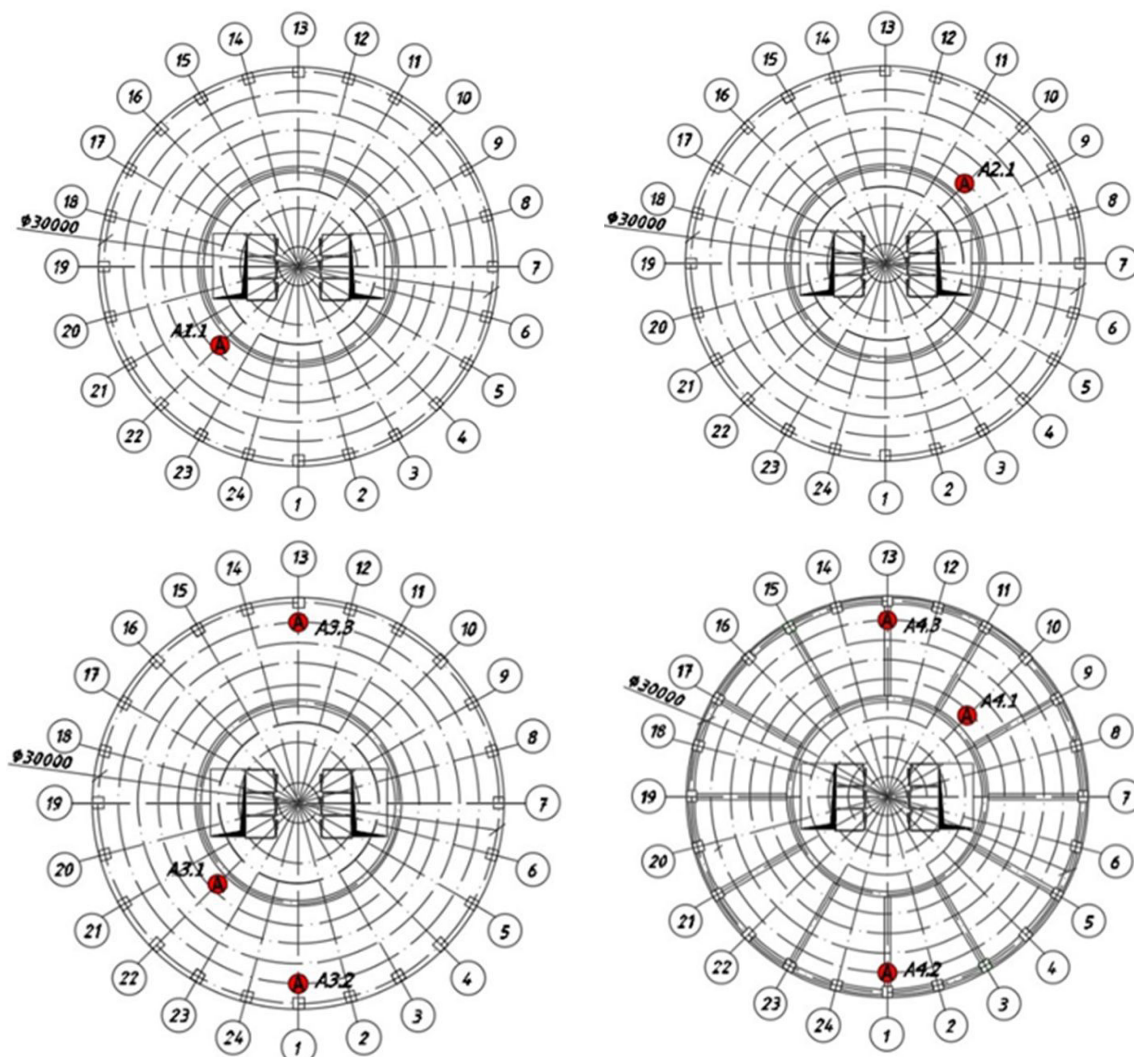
Location of inclinometers for the shell structural system with outrigger floors on 6, 12, 18, 25 floors
